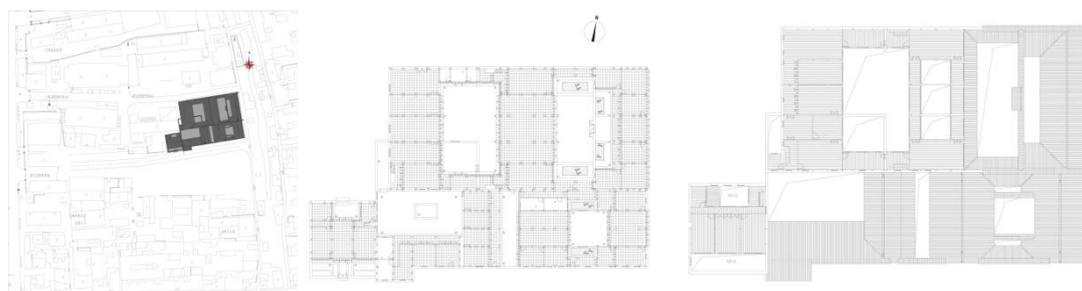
Master Plan(self-drawing) Fig.4.11 First Floor Plan (self-drawing) Fig.4.12 Second Floor Plan(self-drawing)
